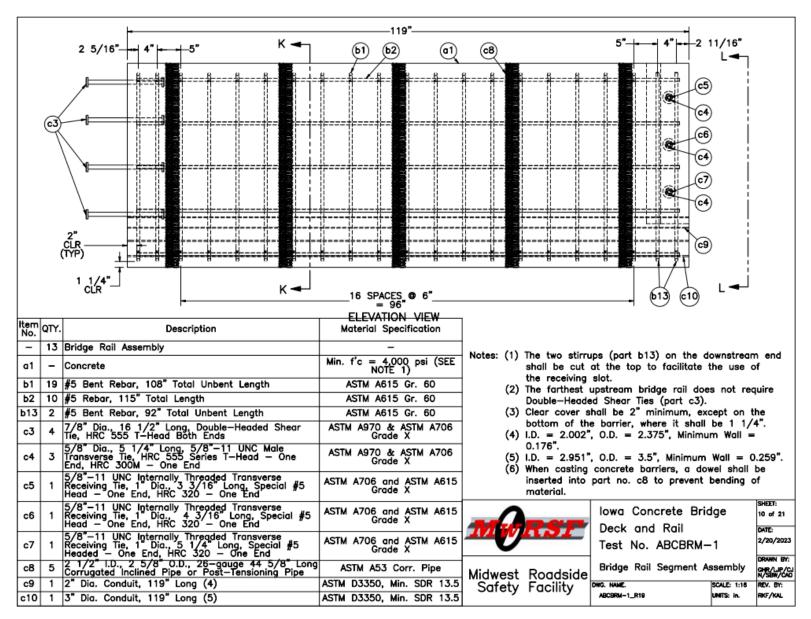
Bridge Rail Segment Assembly, Test No. ABCBRM-1
